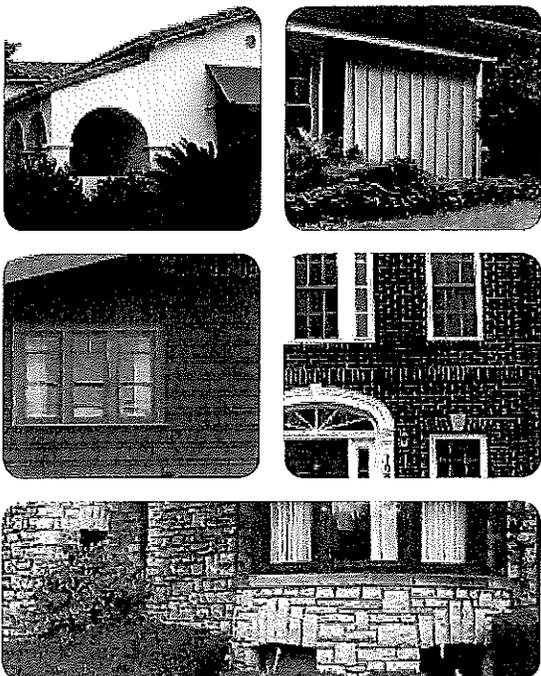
Recommended wall materials include (clockwise from top left) Smooth Stucco, Board-and-Batten wood siding, Wood Shingles, Brick and Stone
